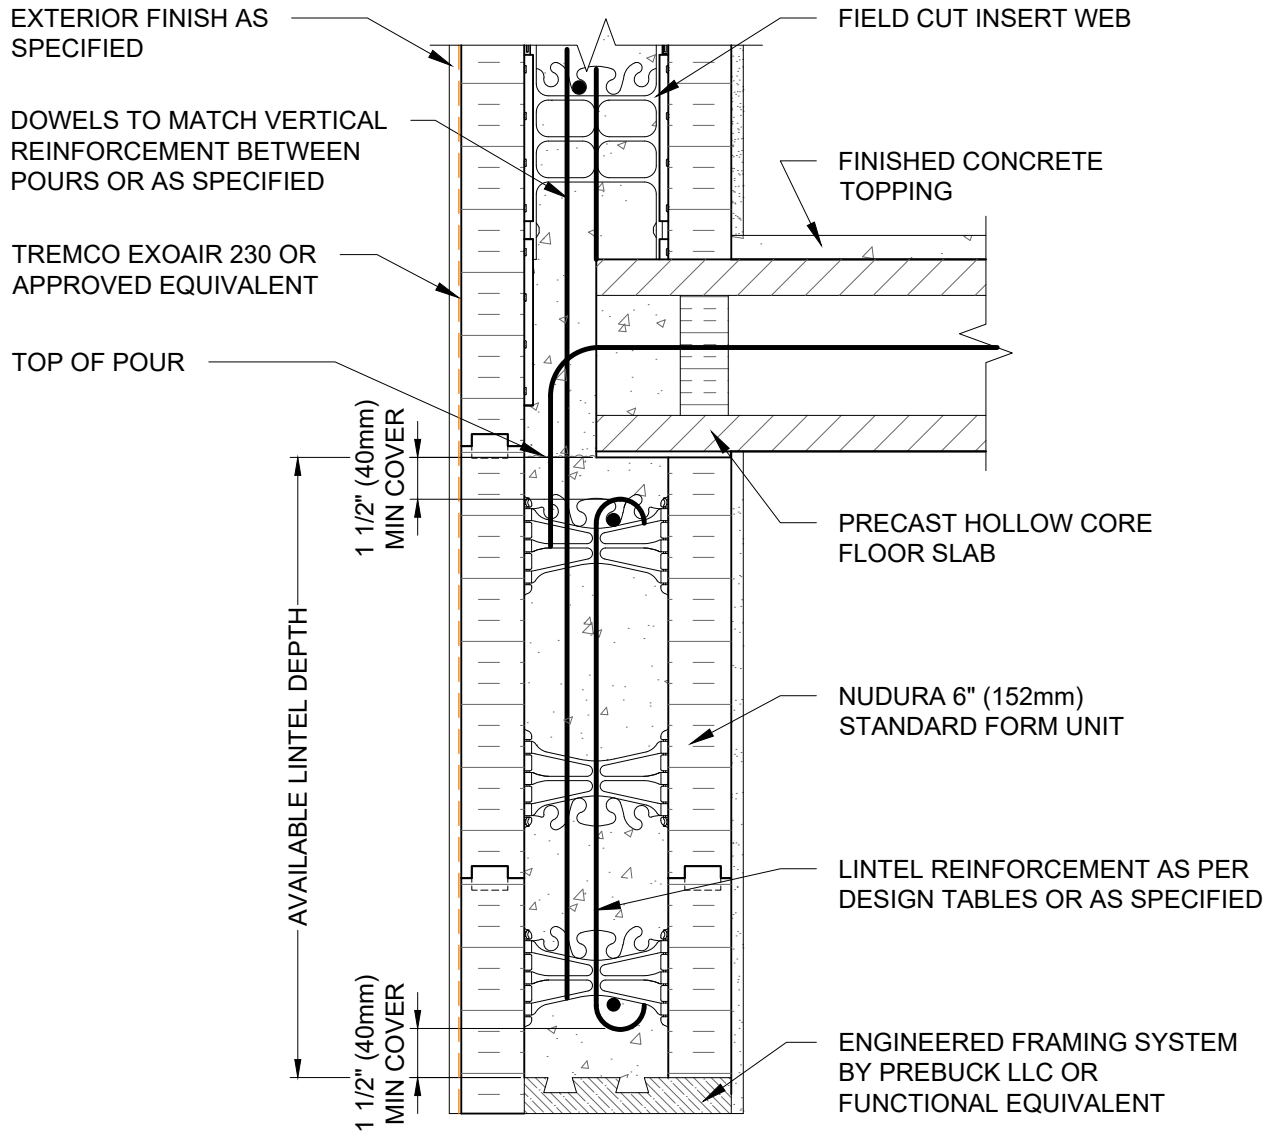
" (152mm) Form Unit Typical Lintel Construction, Intermediate Floor
